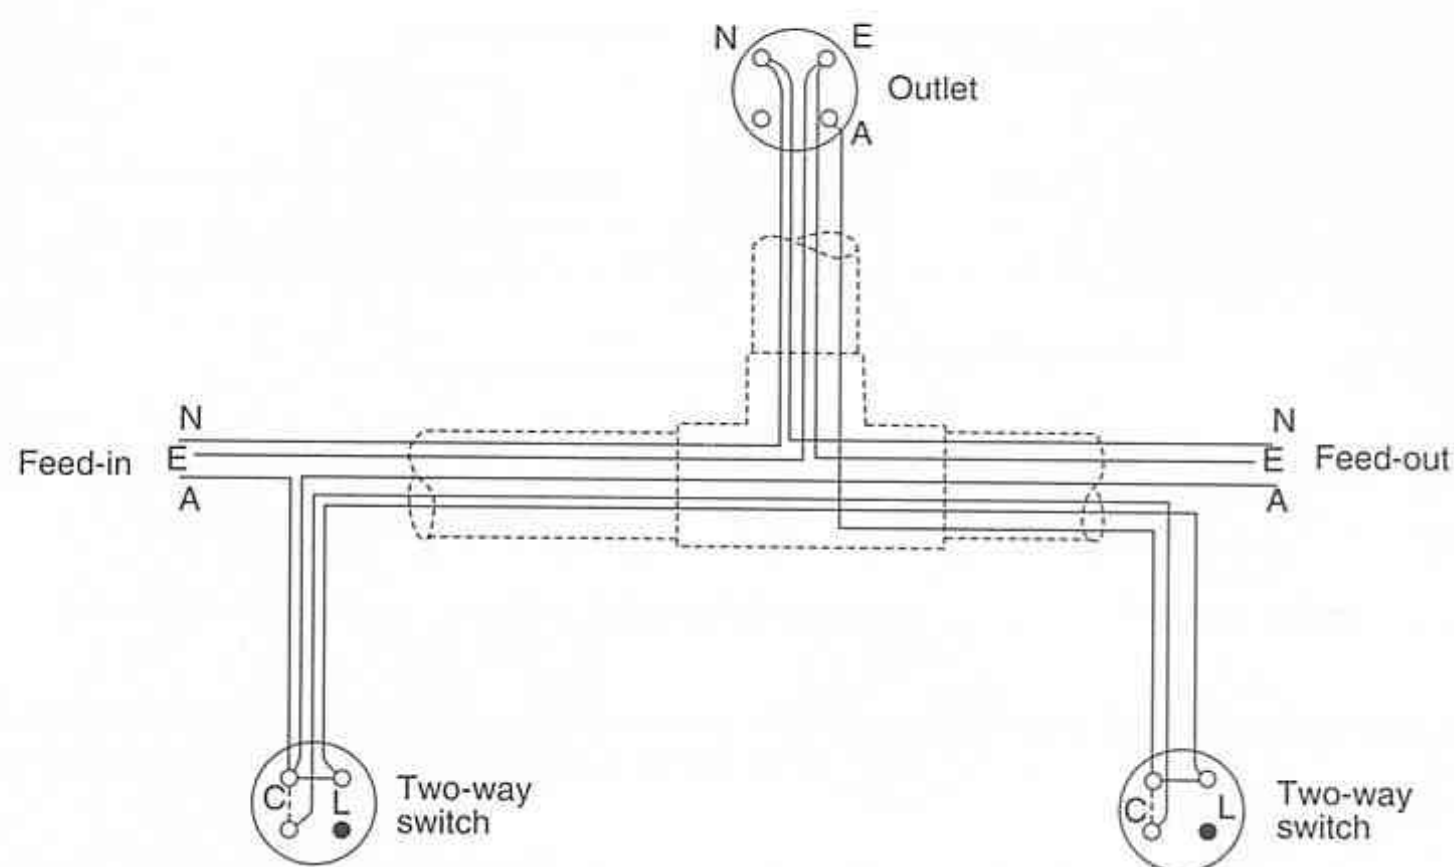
Connections for two-way switching using the 'looping-in' system with surface wiring in conduit
